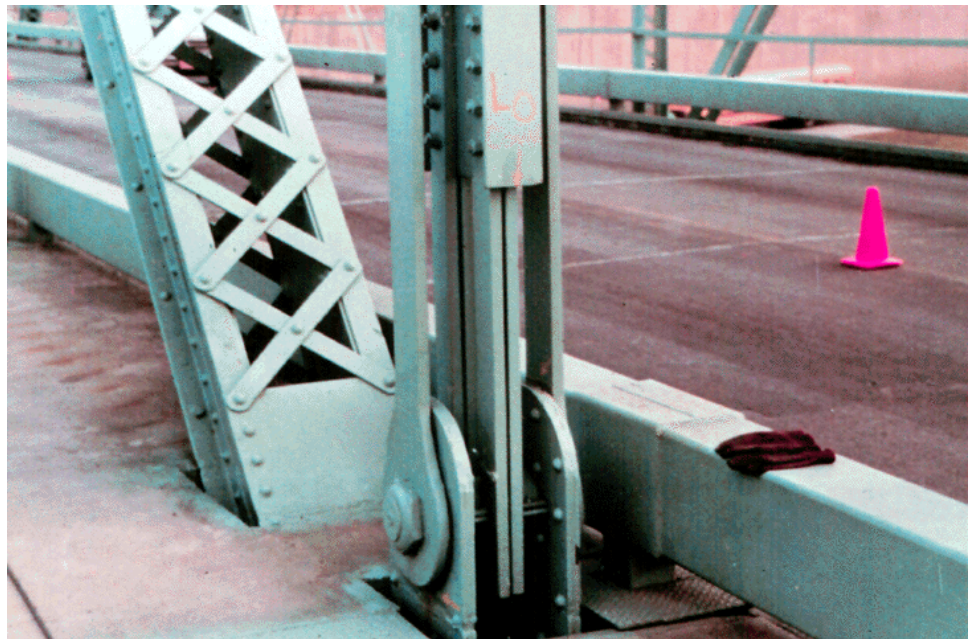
Retrofit of Eyebars to Add Redundancy
